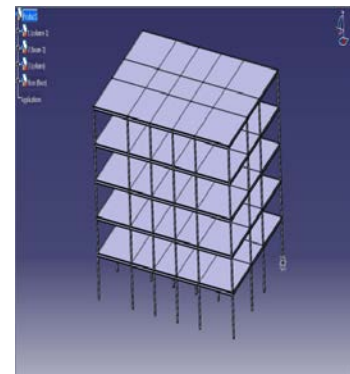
CATIA model steel frame having shear wall in the centre bays with wooden floor
